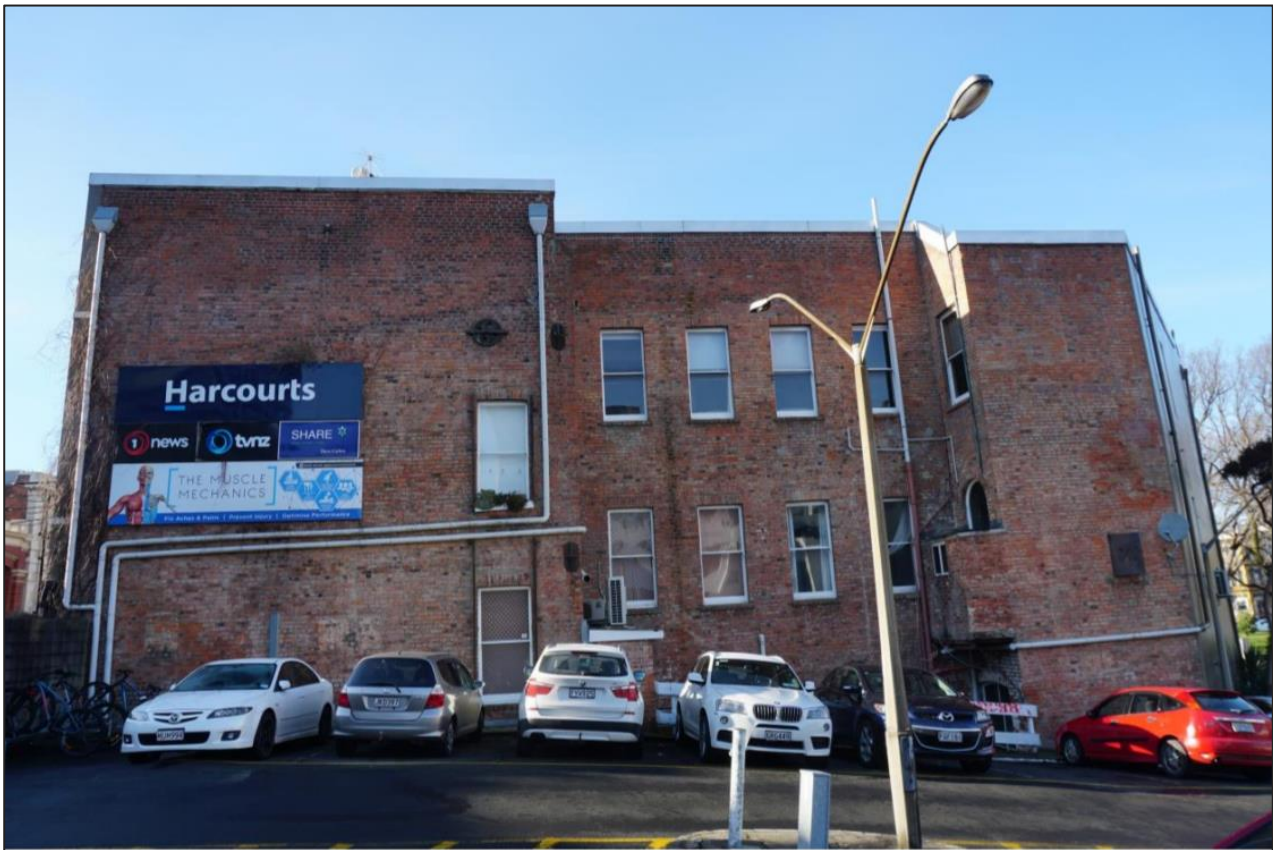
Parts of building at 9 Dowling Street facing the subject site.
